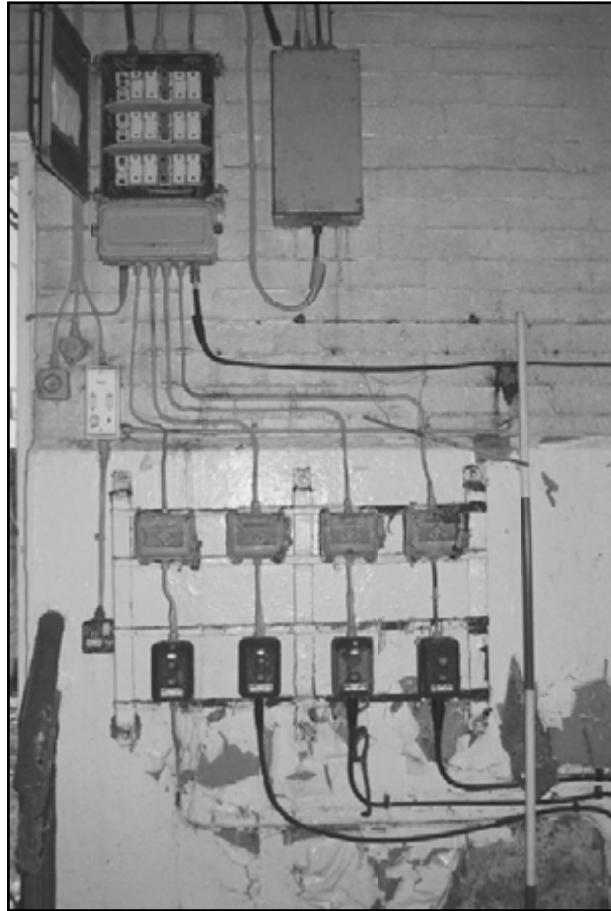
Detail of electrical switches on west wall of room 3 (film 6.09)
